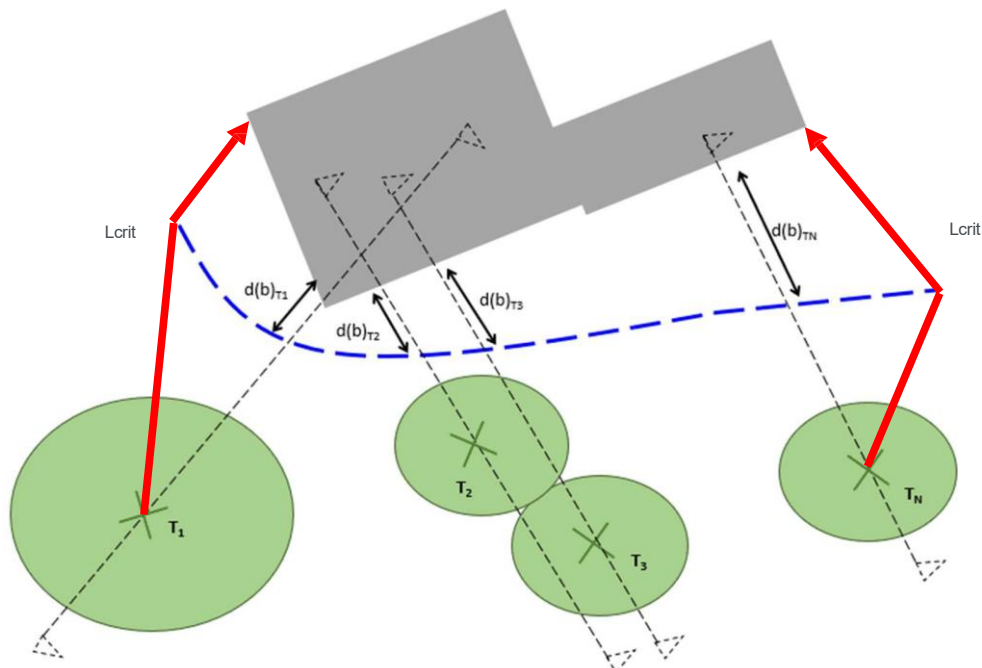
Plan Drawing Illustrating the General Case for the Root Barrier Calculations
